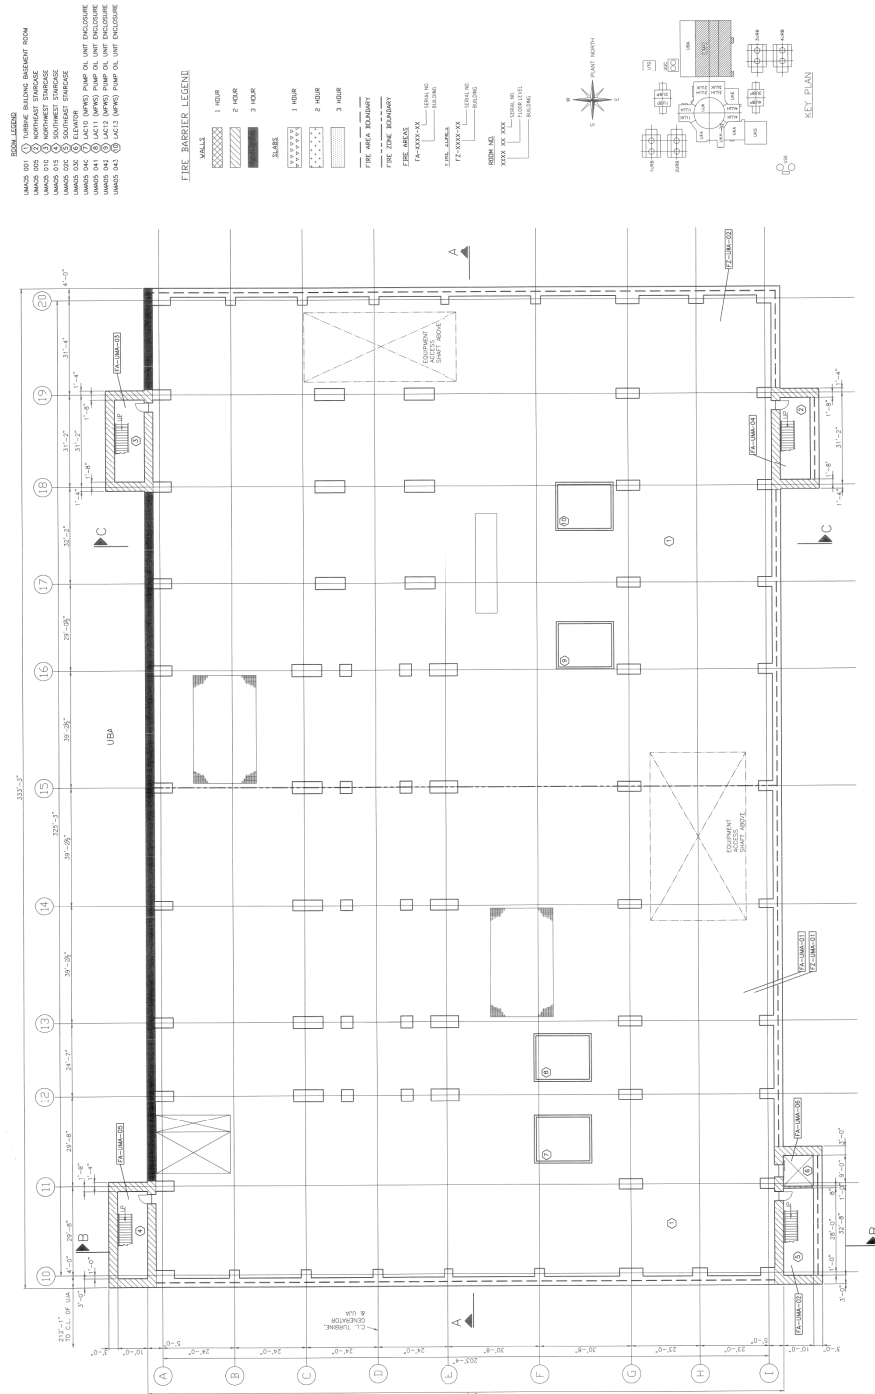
B-2—{CCNPP Unit 3 Fire Barrier Location, Turbine Building Plan at Elevation +/- 0 Feet}
